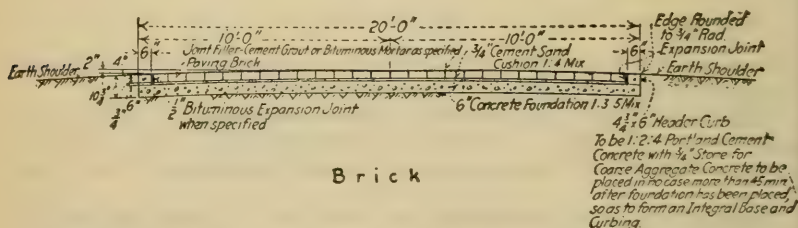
B.—Standard brick pavement. State of New Jersey (1922).
